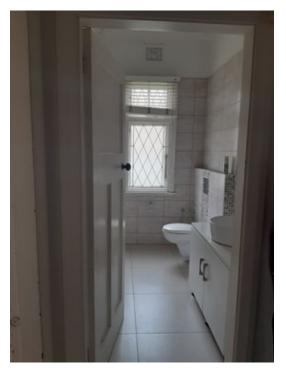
Internal view of bathroom. Has been recently revamped to a modern finish
